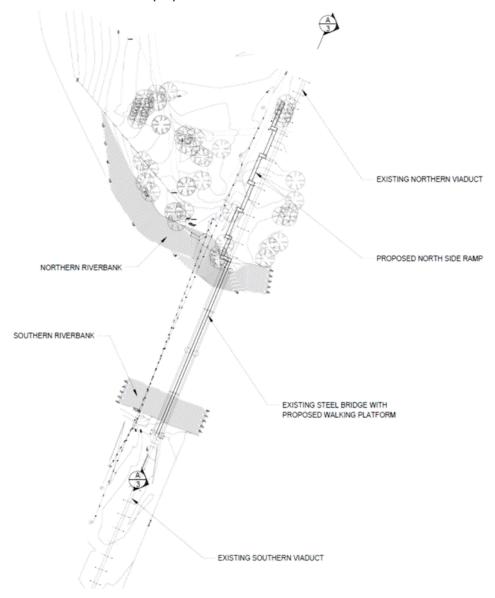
Extract: Site Plan (Source: ACME, 2021)
